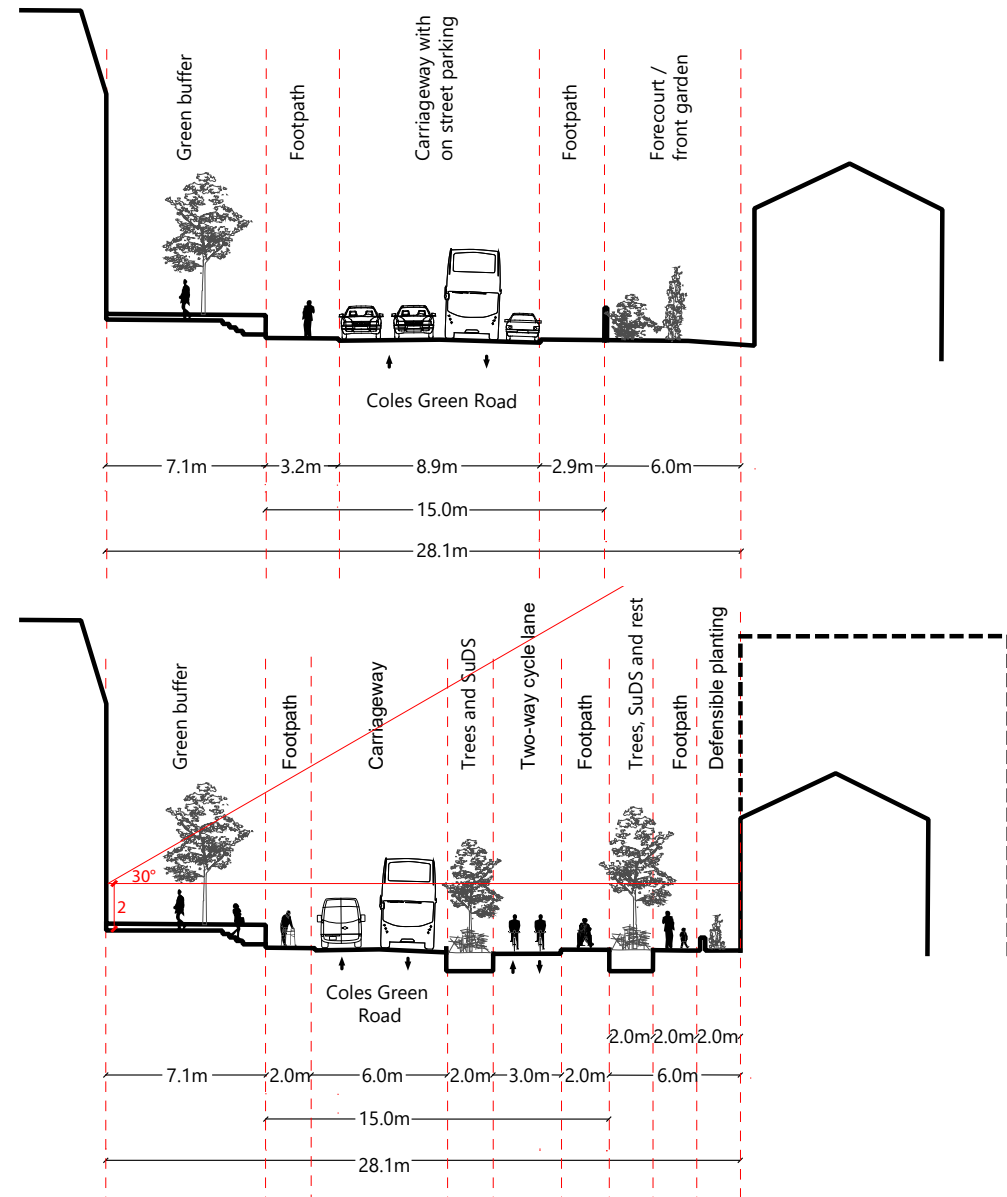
Existing and aspirational sections through Coles Green Road (south)
